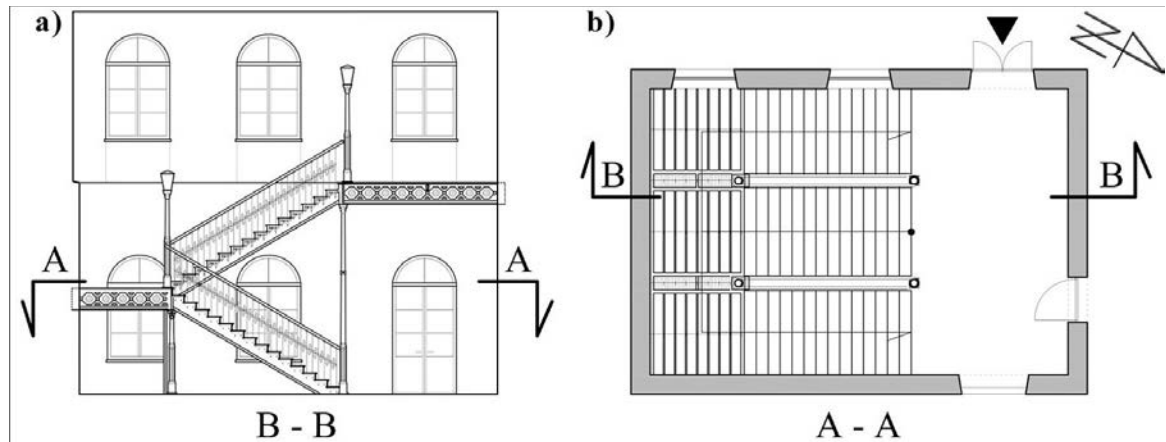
Cast iron staircase, stocktaking:(a) longitudinal cross section; (b) floor plan at the height of first platform.
